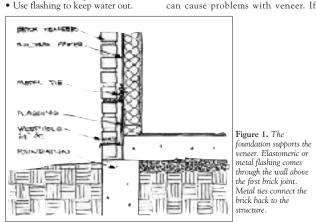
The foundation supports the veneer. Elastomeric or metal flashing comes through the wall above the first brick joint. Metal ties connect the brick back to the structure.
